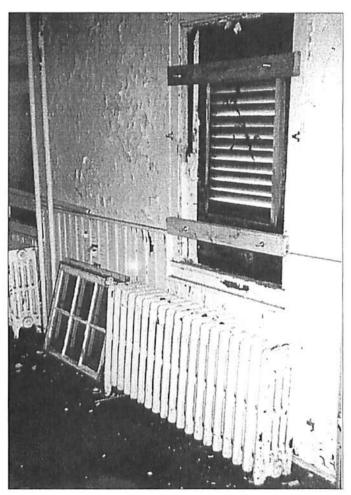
Pairs of metal bolts and wood 2 x 4s on the interior of the house hold the exterior plywood window panels in place.
